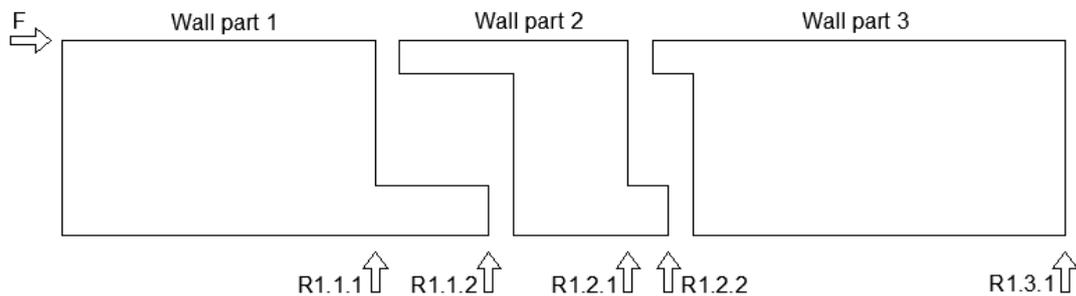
The locations of the reaction and anchoring forces in wall 1.
